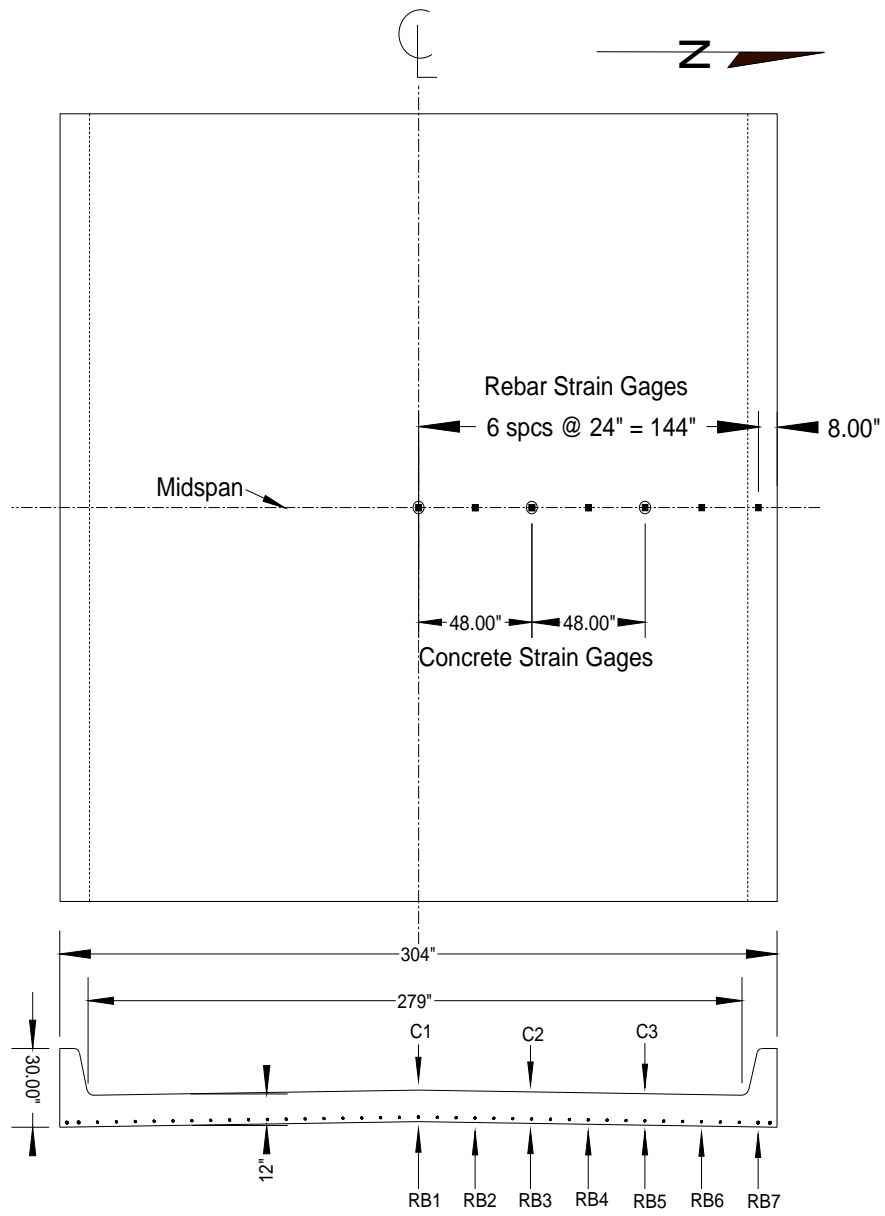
Detailed Locations of Rebar Gages and Slab Gages.
